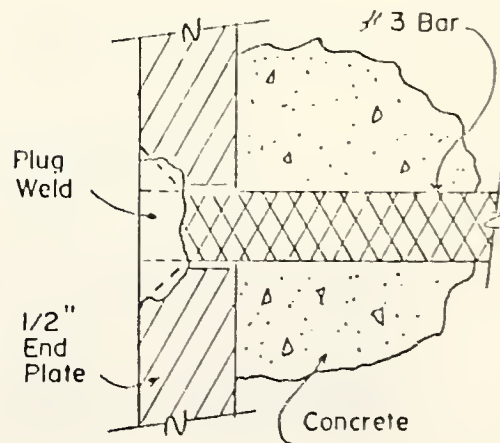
ILLUSTRATION FOR CONNECTION BETWEEN END PLATE AND REINFORCING BAR
